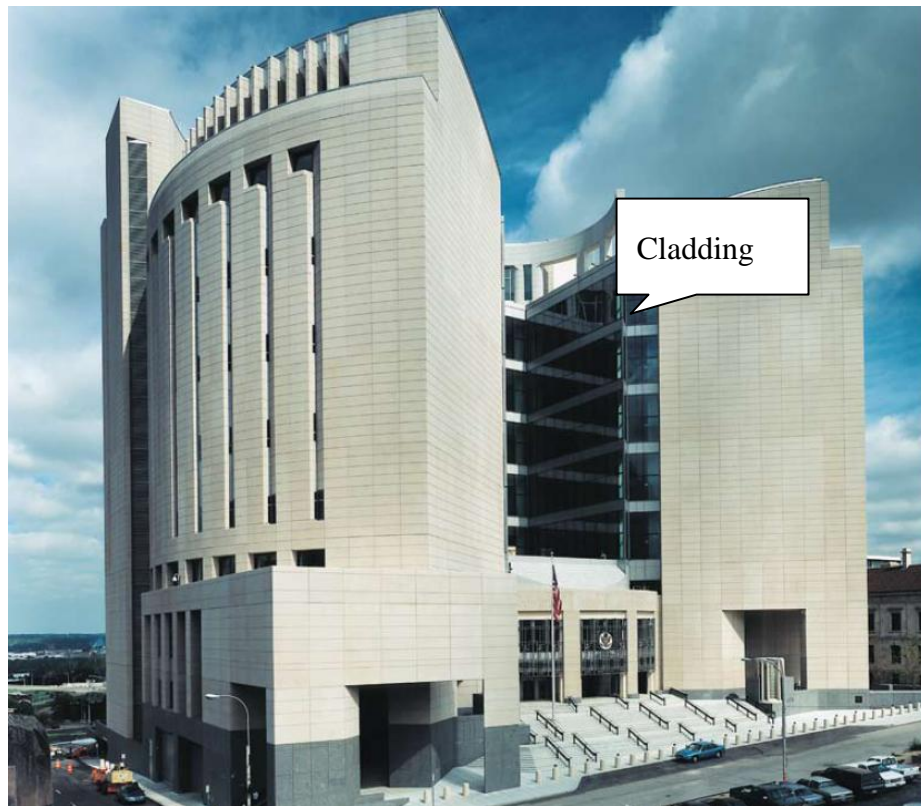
Window wall panels (from Precast/Prestressed 2007, by permission)
